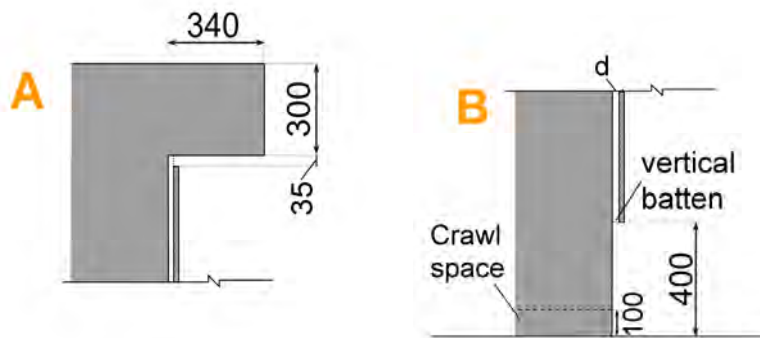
Detailed cross sections of the test house, as outlined in Figure 5.4. a) top with roof overhang b) bottom of test house.
